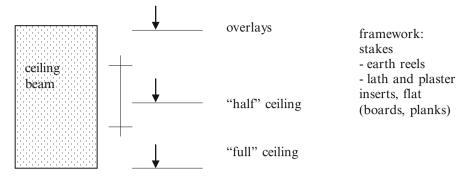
Earth building materials in timber beam ceilings, position of the structural support frame for the earth building materials
